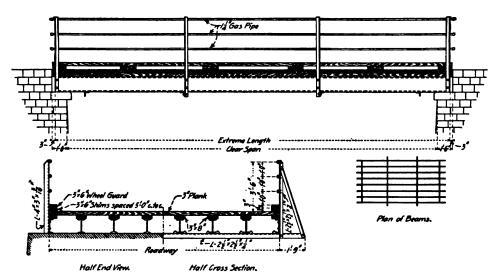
BEAM BRIDGE. AMERICAN BRIDGE COMPANY.
